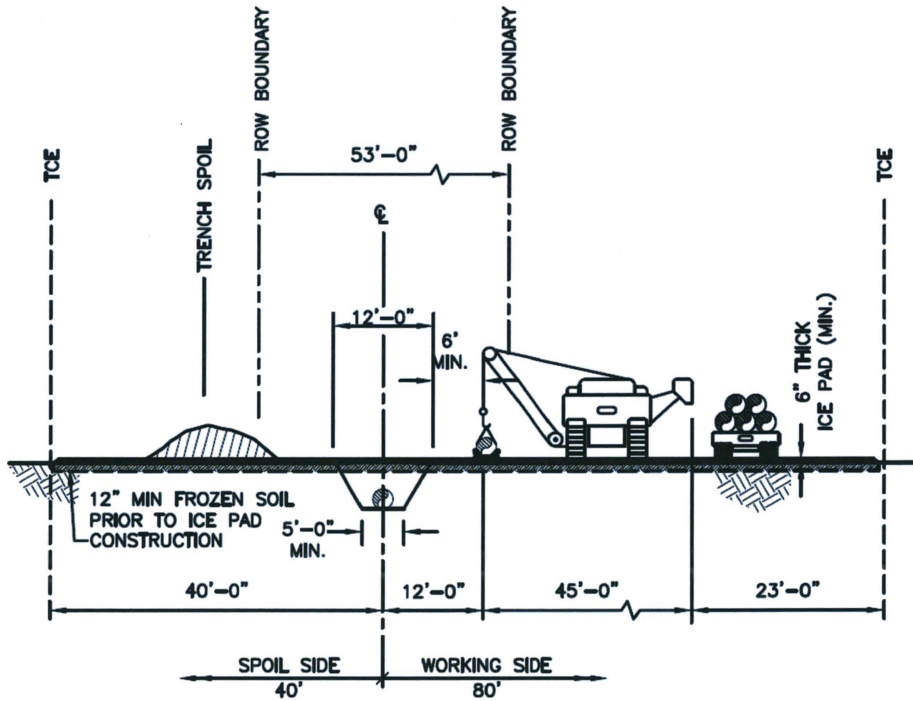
ASAP Typical Right of Way – Tundra Ice Road
